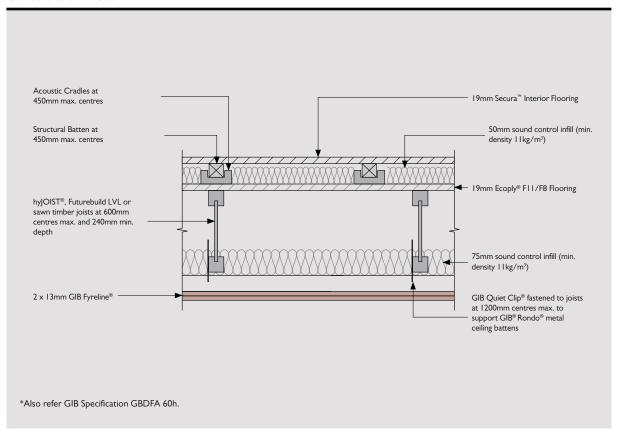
GIB® Noise Control Installation - with Secura™ Floating Flooring
